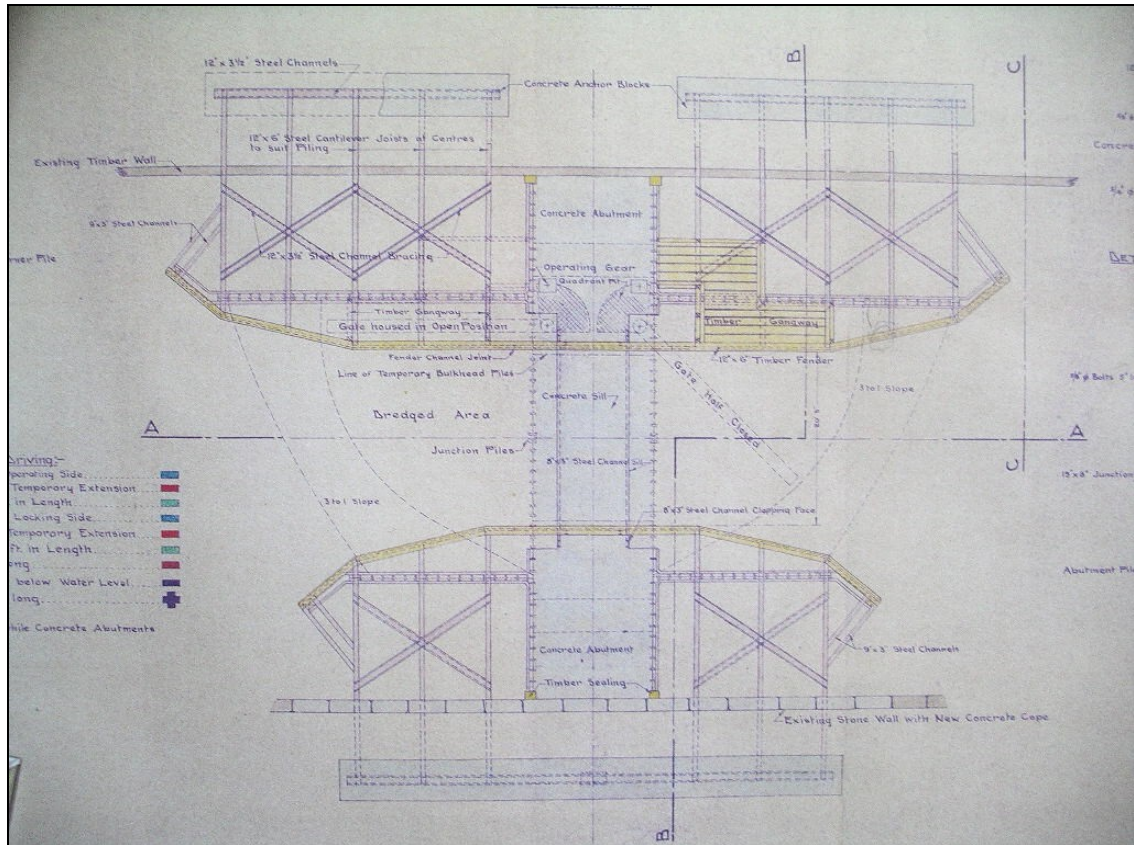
plan NAS RHP41531 showing location of safety gates
